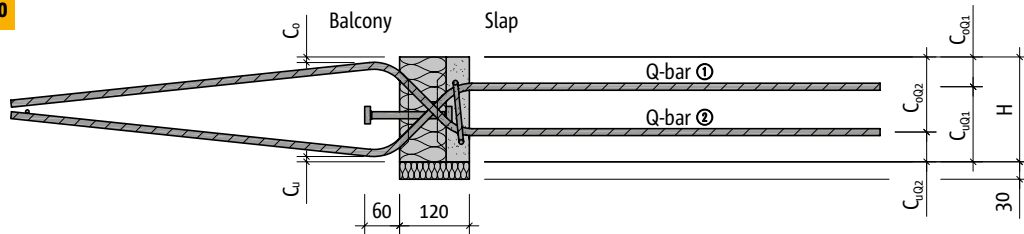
Section: Schöck Isokorb® type RQP70+RQP70
